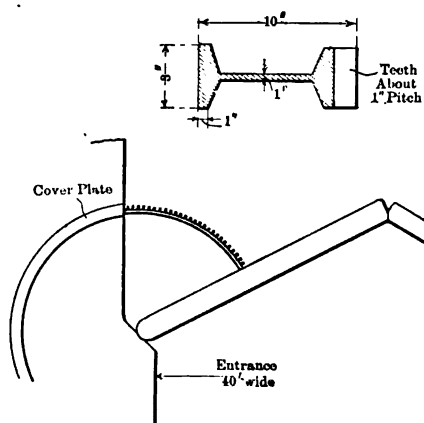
Section and Plan of a Cast-iron Arc Spar as Used on the Locks of the Lower Seine for a 40-foot Opening.
